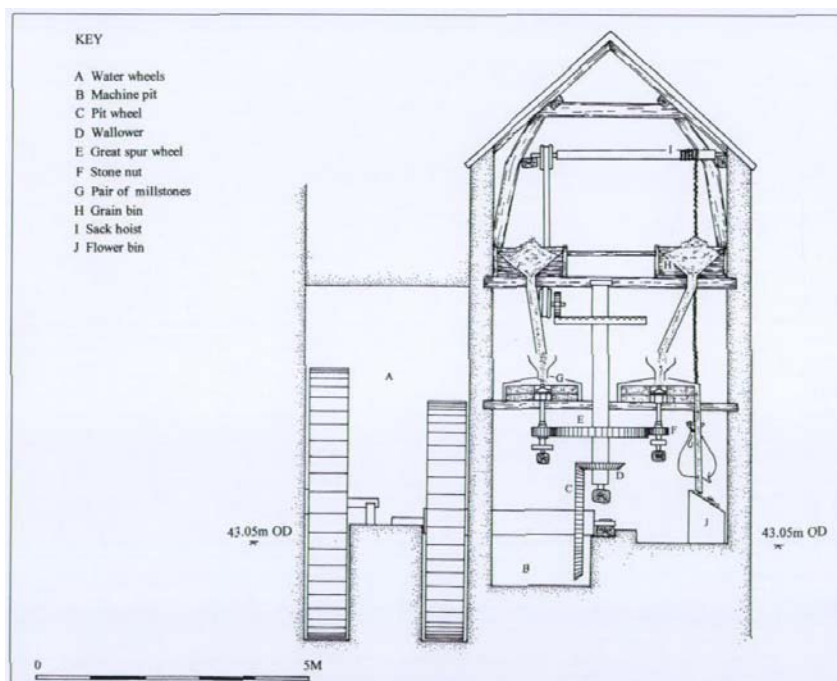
A reconstruction drawing of the mill machinery at Greensbridge mill (Walshe's Mill) (M. Gowen and Co. Ltd.).
